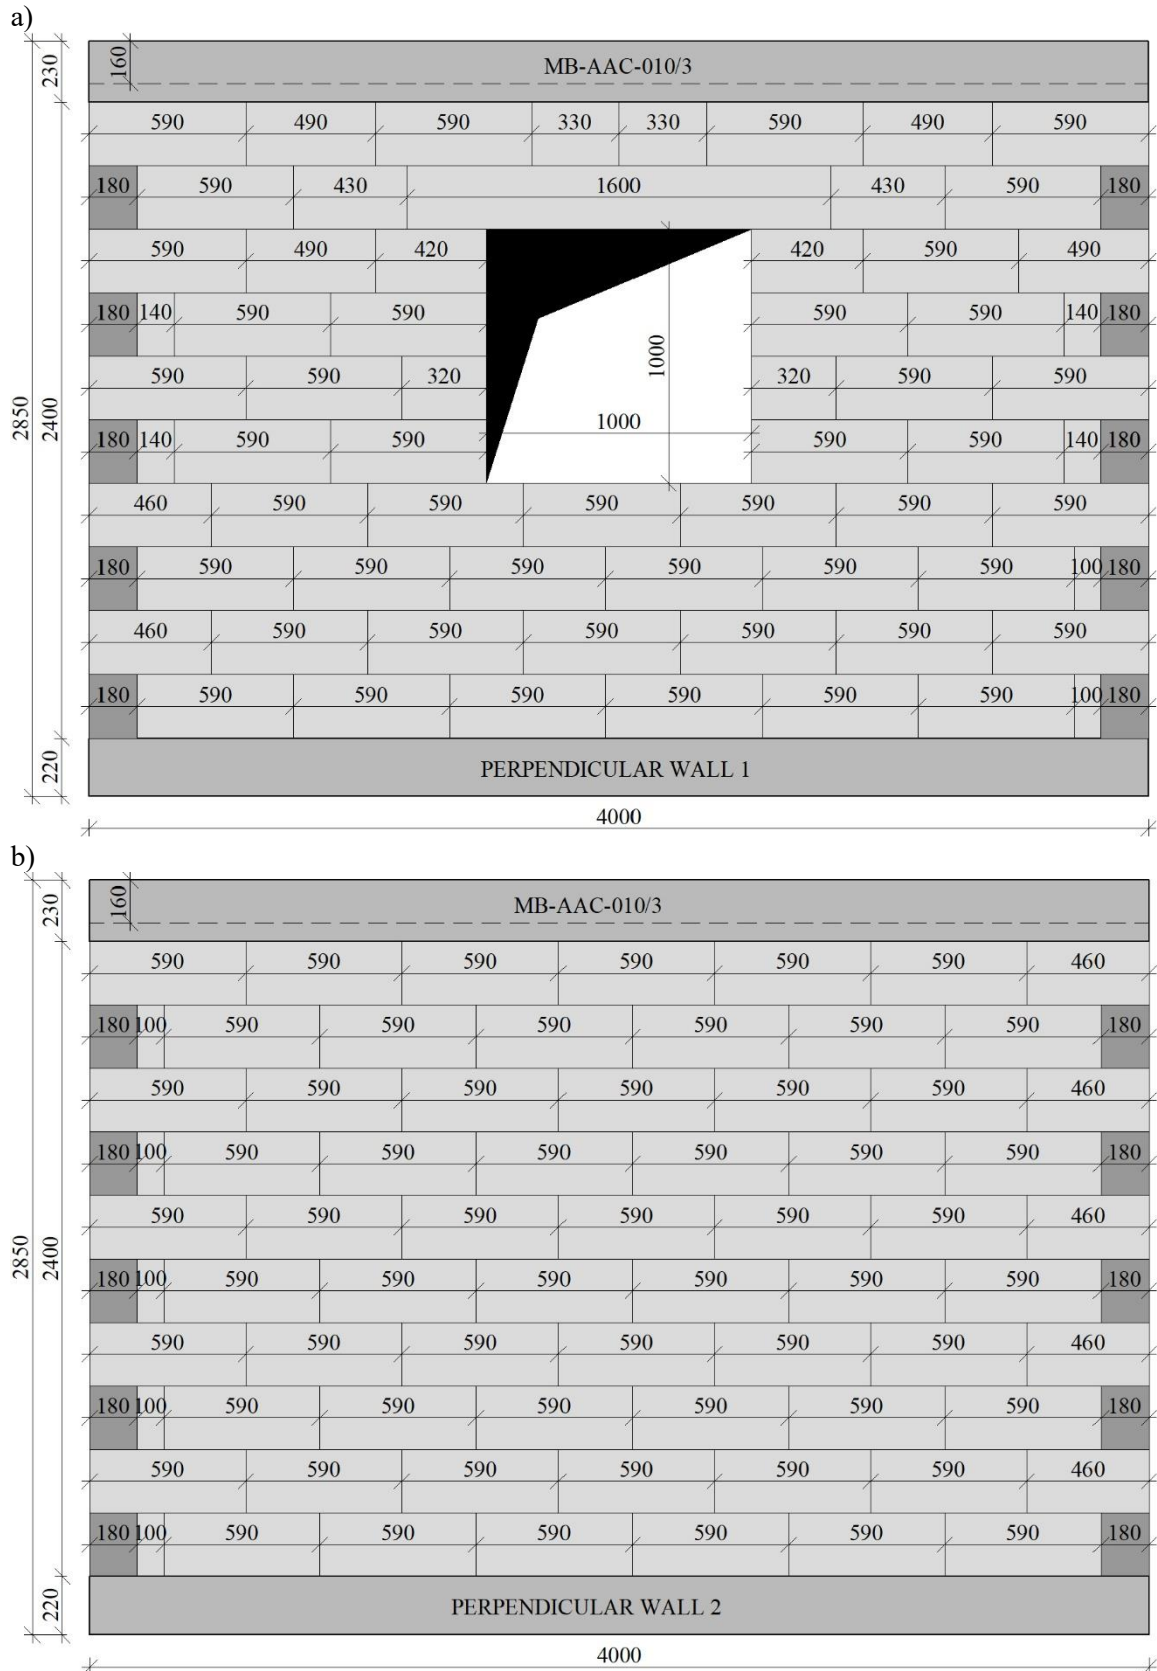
Design of the MB-AAC-010/3 model: a) perpendicular wall 1, b) perpendicular wall 2
